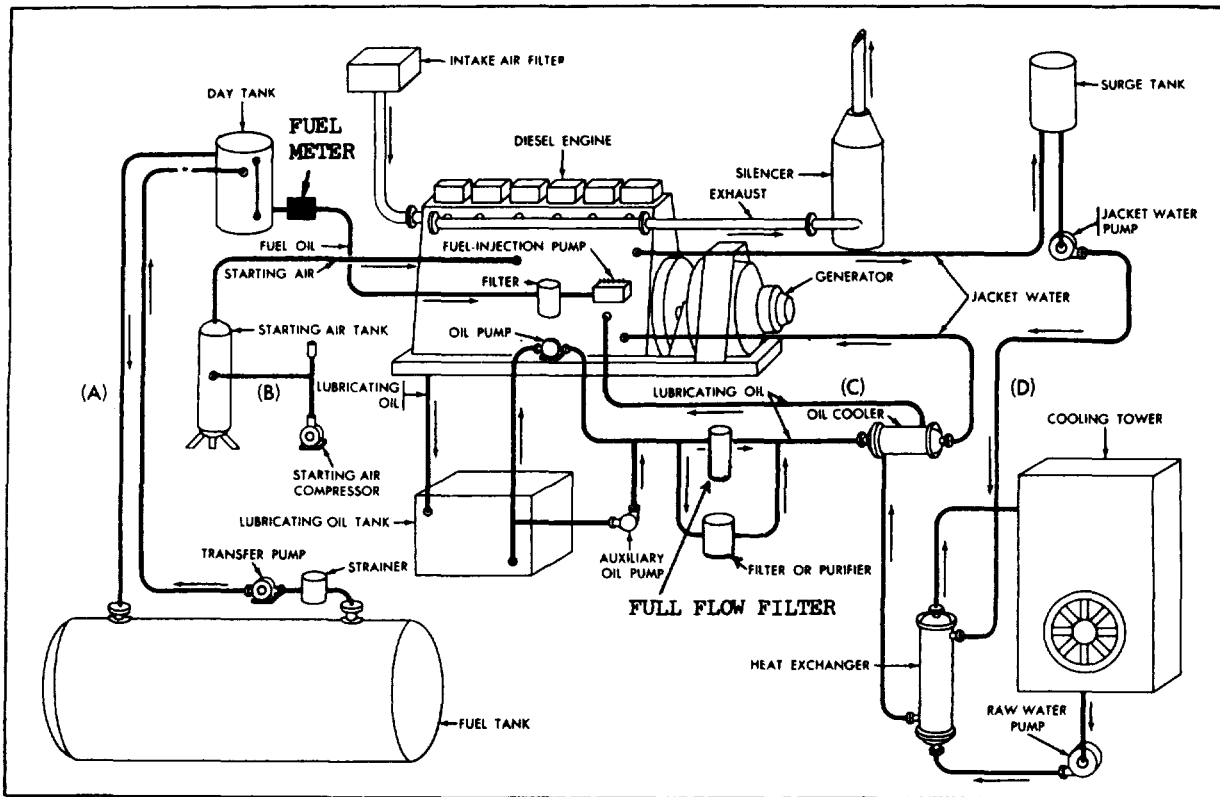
Fuel and Other Auxiliary Systems of a Diesel Engine Installation.
